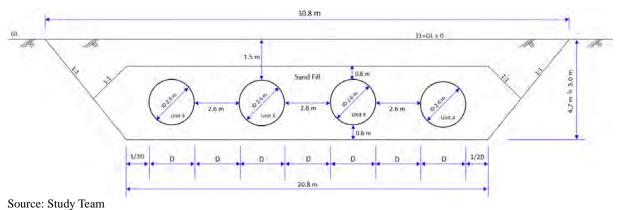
Section of a Standard Underground Discharge Channel (Pipe)
